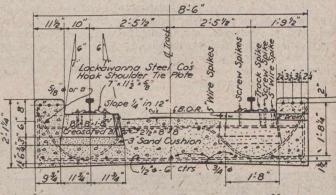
TYPE 2 OF CONCRETE FOUNDATION ON NORTHERN PACIFIC RY.
